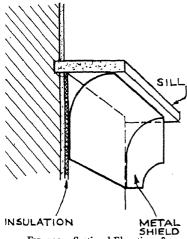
Sectional Elevation of Metal Radiator Shield.
